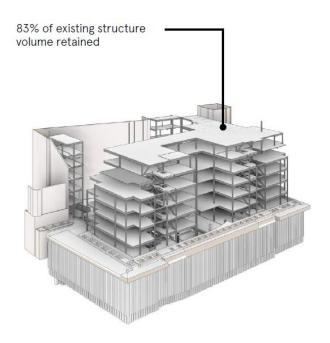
83% of the existing structure volume would be retained, including the steel frame and foundations.
